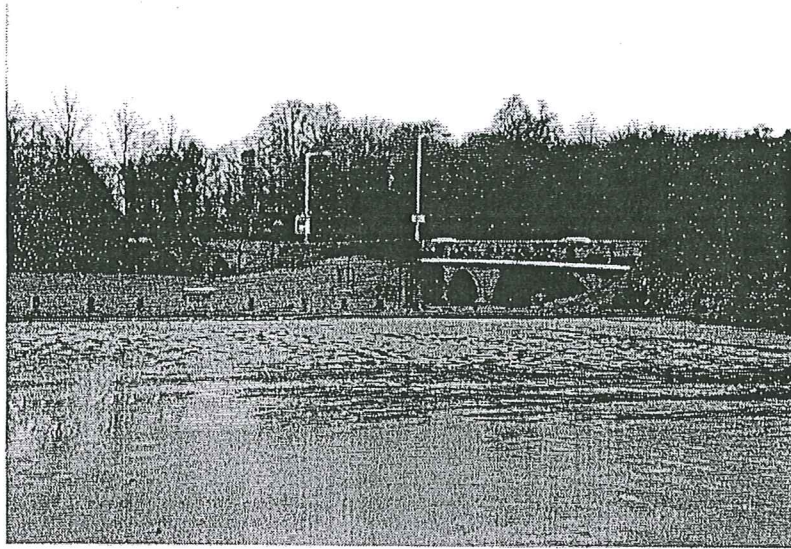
BLANDFORD BRIDGE AND JULIANS BRIDGE
